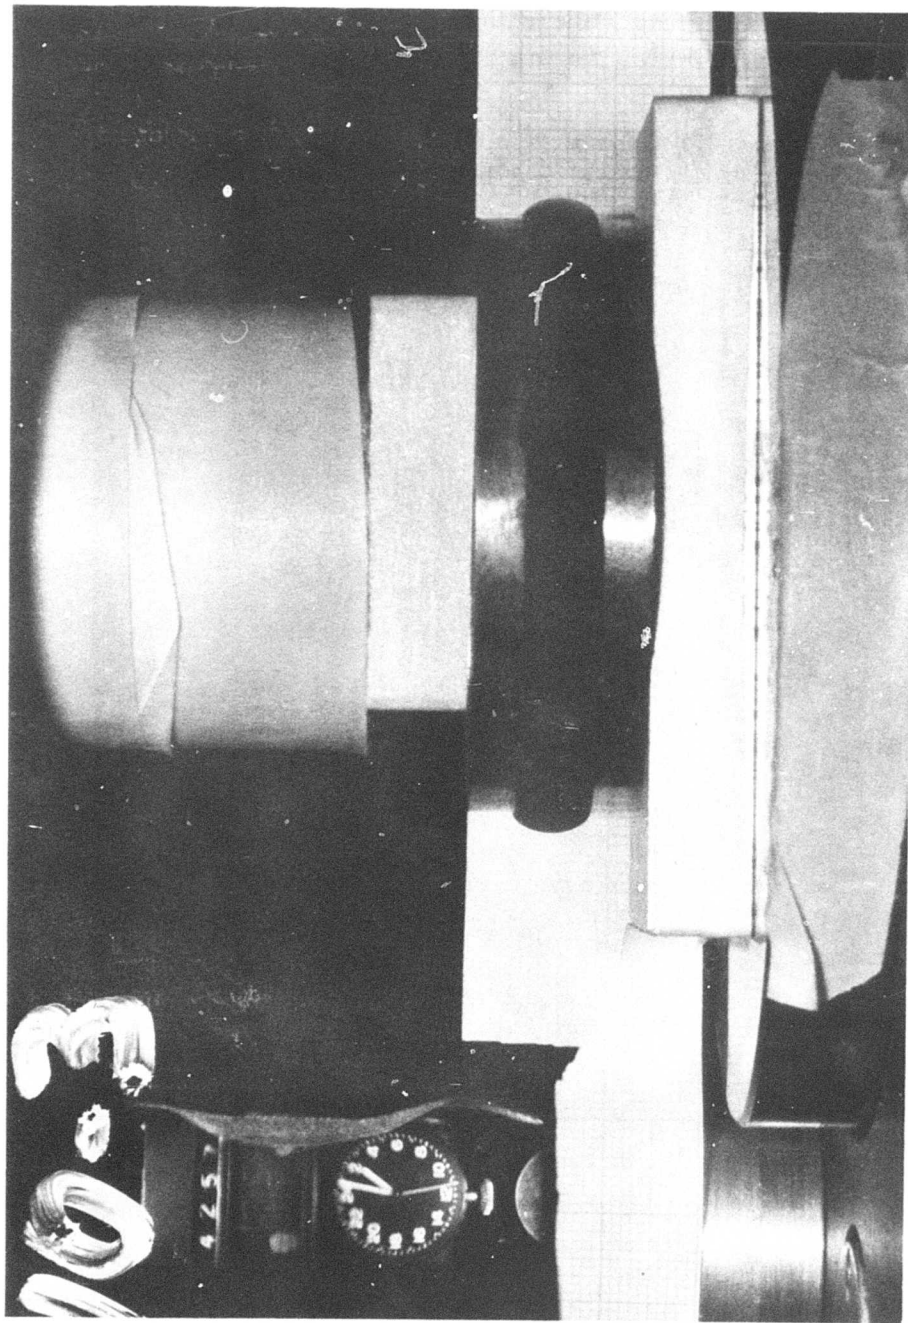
Typical Compressive Testing at 160°F, Specimen 10-1, 15% Deflection
